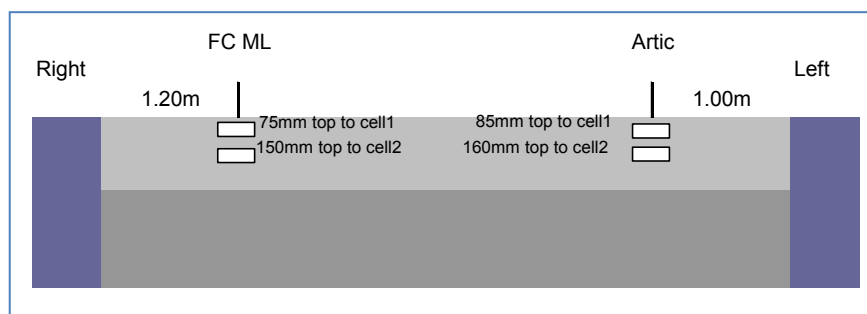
εmu Coils' layout at Trial 9 &amp; 10
